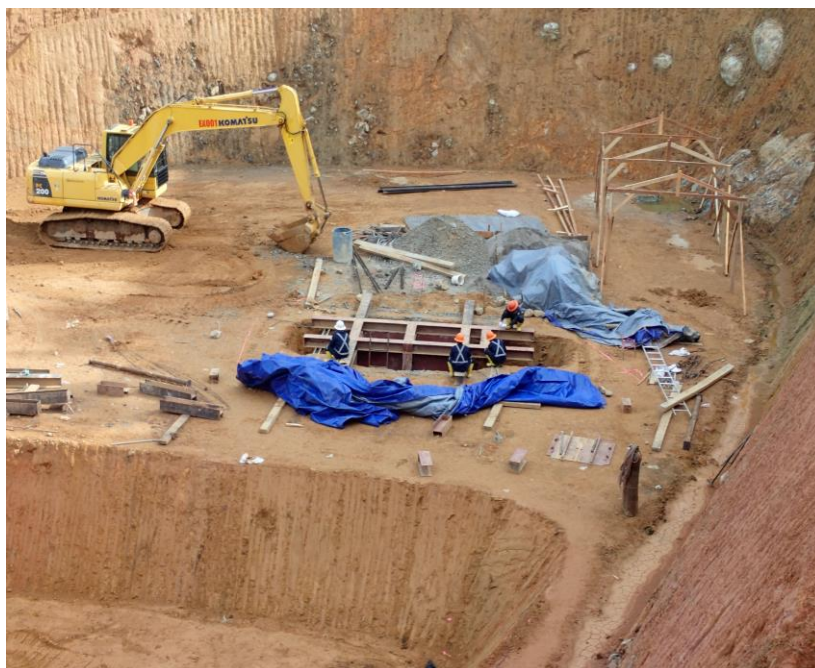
Preliminary site works and shaft collar installation at the Talang Santo Mine
